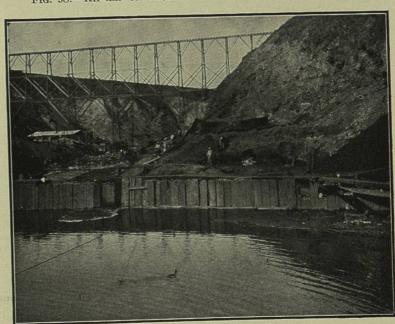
Waialua Dam, Hawaii. Looking Down-stream through Dam-site, Showing Diverting Dam at Upper Toe, and Trestle for making the Rock-
